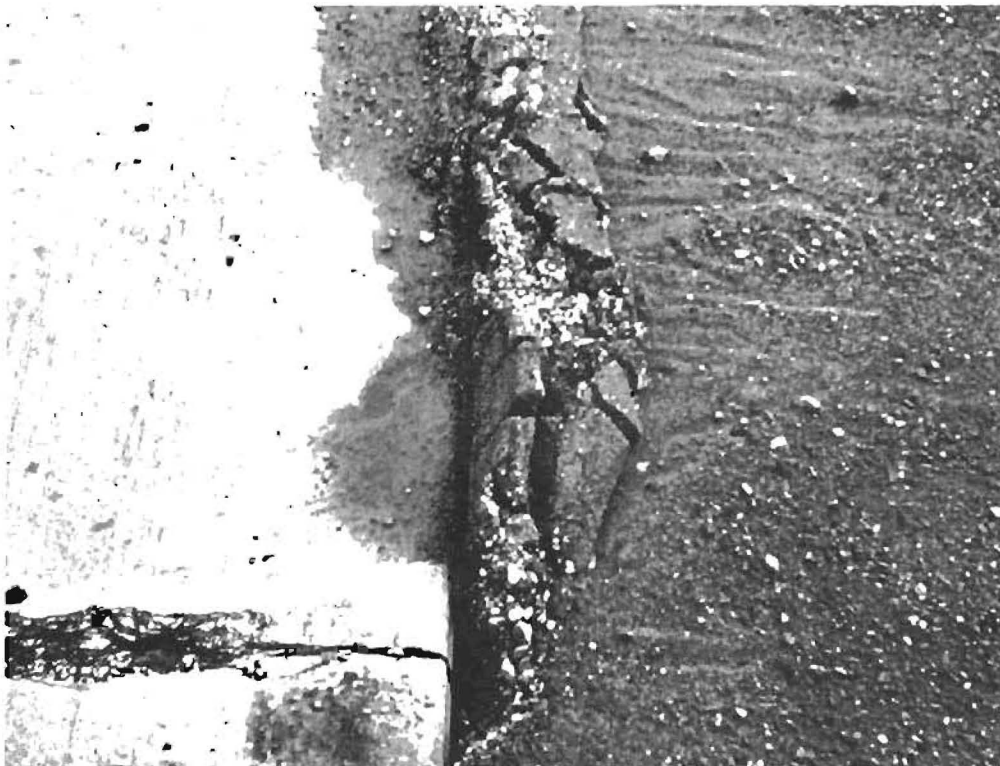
Subbase material ejected from beneath pavement at the AASHO Road Test after a heavy rain.
